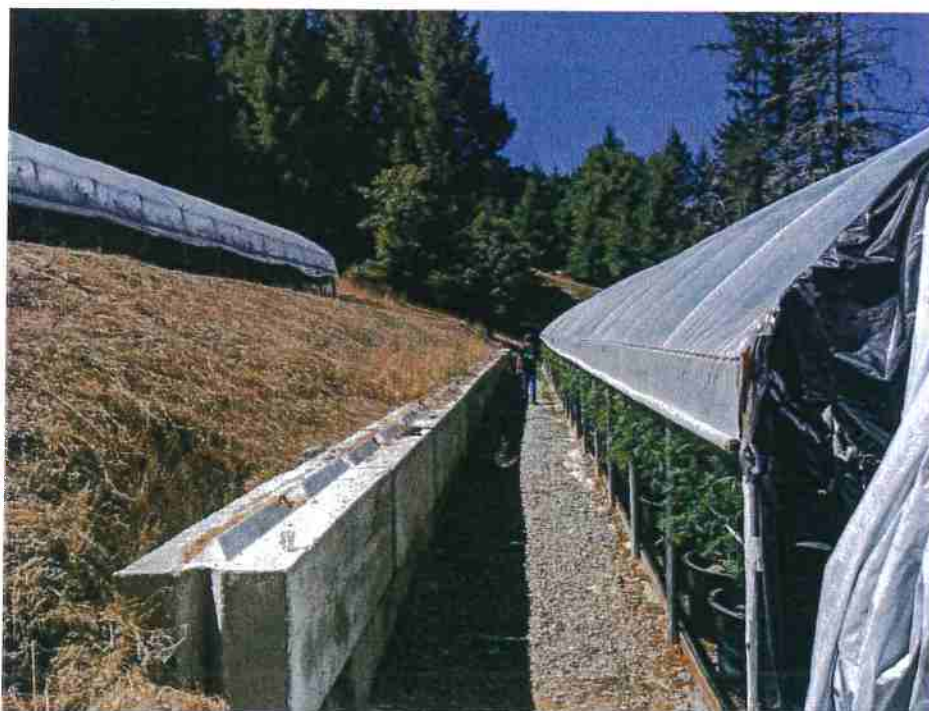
MIDDLE GREENHOUSE LOOKING APPROXIMATELY SOUTHWEST. NOTE
